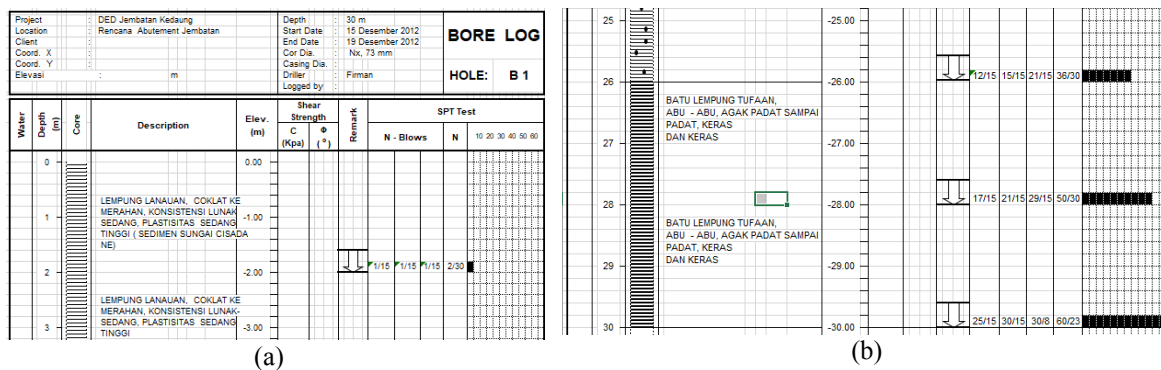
(a) Upper section of boring log B1 report, (b) Lower section of boring log B1 report.
